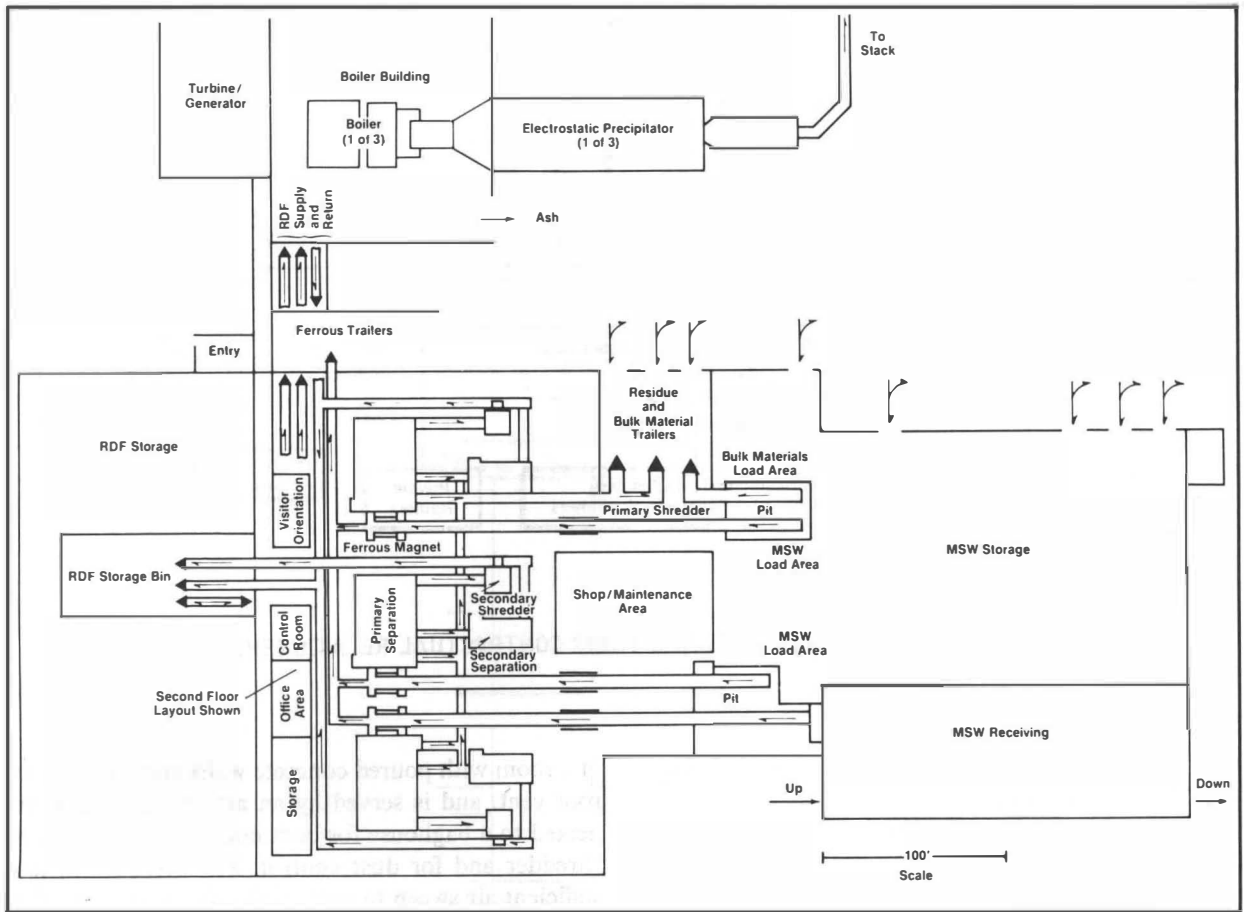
MAJOR EQUIPMENT LAYOUT FOR DETROIT FACILITY
